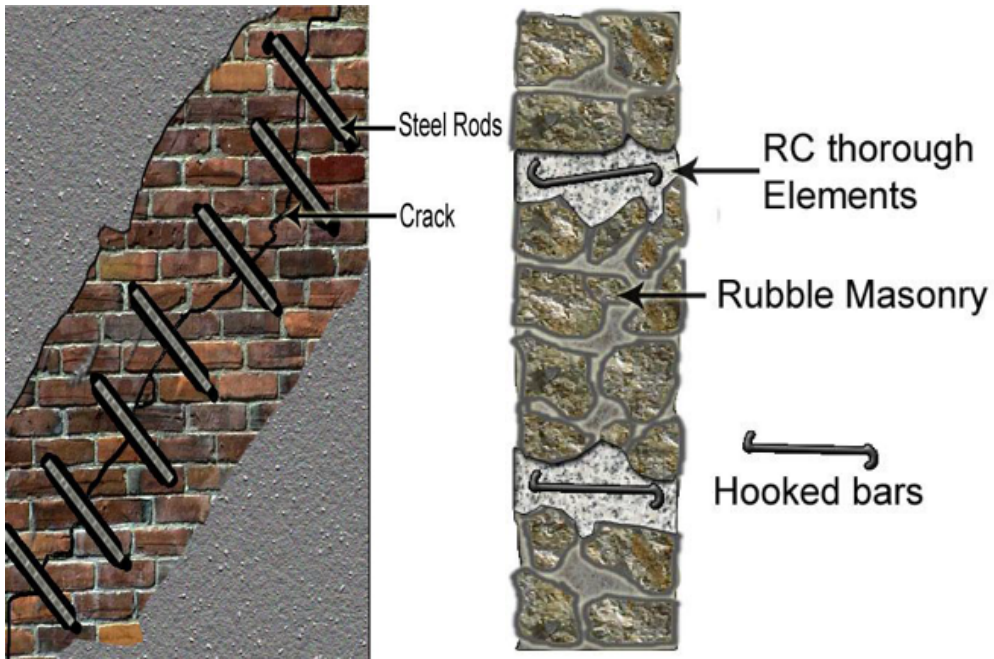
crack repair using 6 mm iron bars (left) and Hook bars in stone masonry wall (right)
